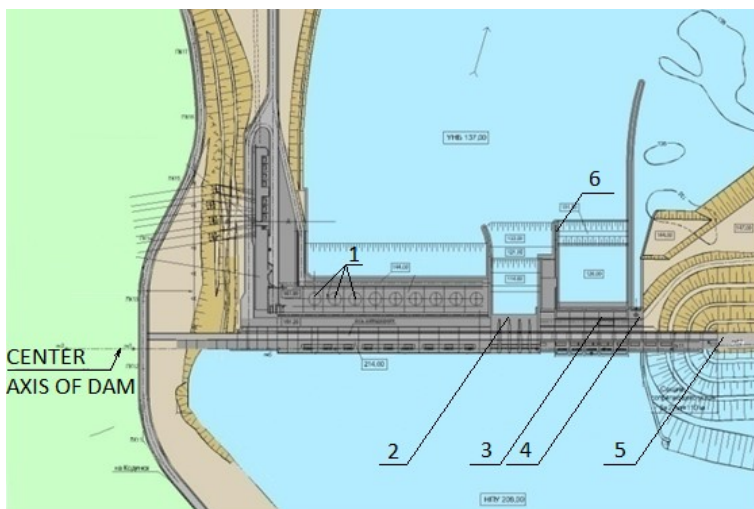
The layout of Boguchansky Hydraulic Plant Constructions:
